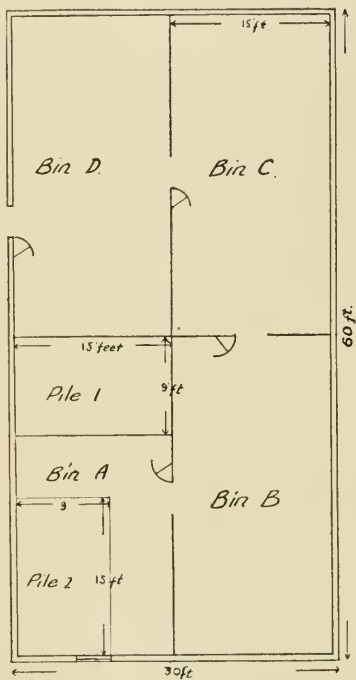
Floor plan of storage house, showing the size and location of bins and the space occupied by the cotton under observation.
